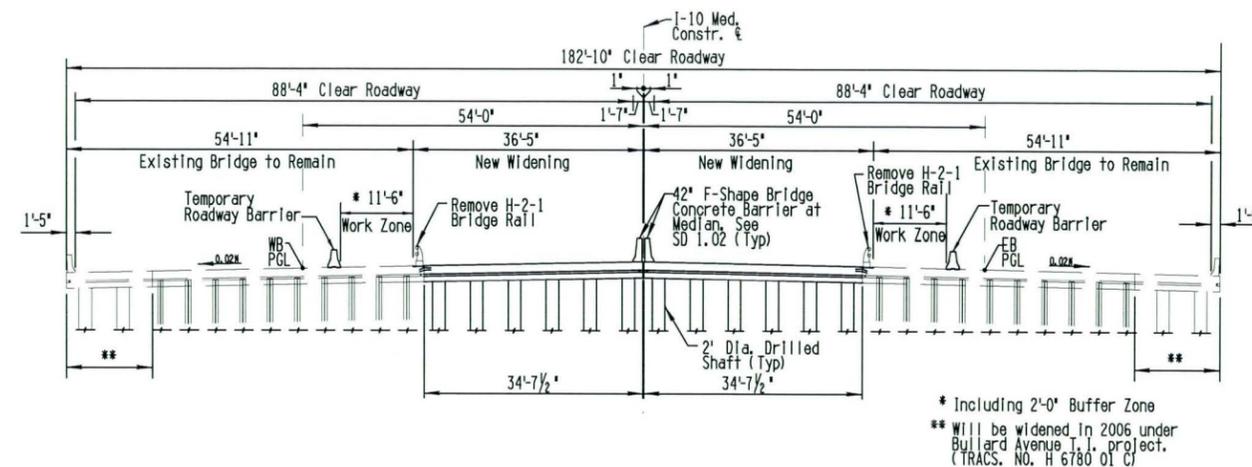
Airport (Bullard) Wash Bridge Typical Section
